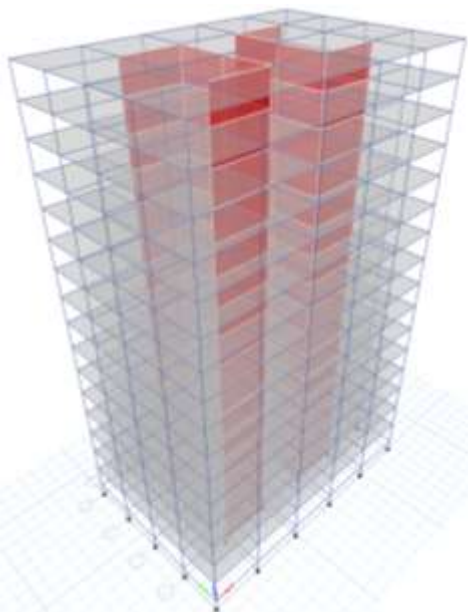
3D view of G+ 15 RC frame with inner shear wall
